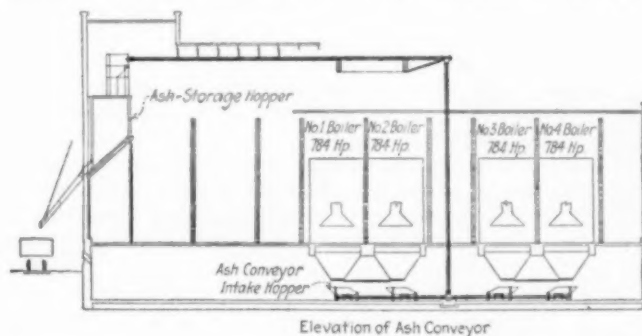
AIR CONVEYOR AT MILWAUKEE SEWAGE-DISPOSAL PLANT. ELEVATION
